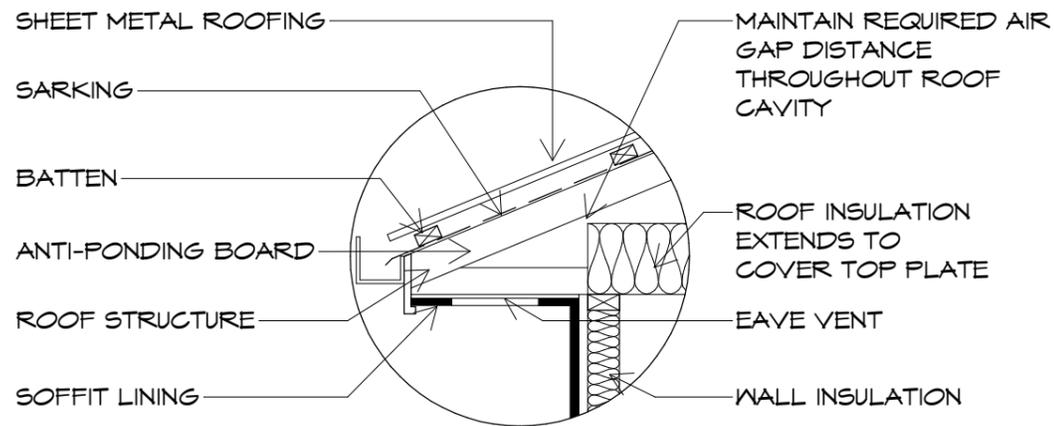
EAVED ROOF WITH EAVE VENT WITH BUSHFIRE CONSIDERATIONS SHOWN
